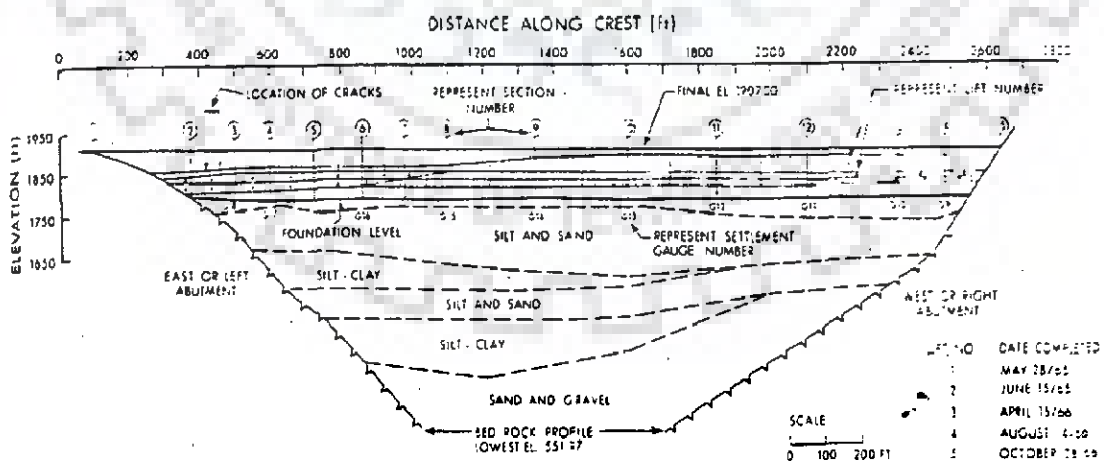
(b): -LONGITUDINAL SECTION OF DUNCAN DAM AND FOUNDATION SHOWING CONSTRUCTION SEQUENCE AND LOCATION OF CRACKS
